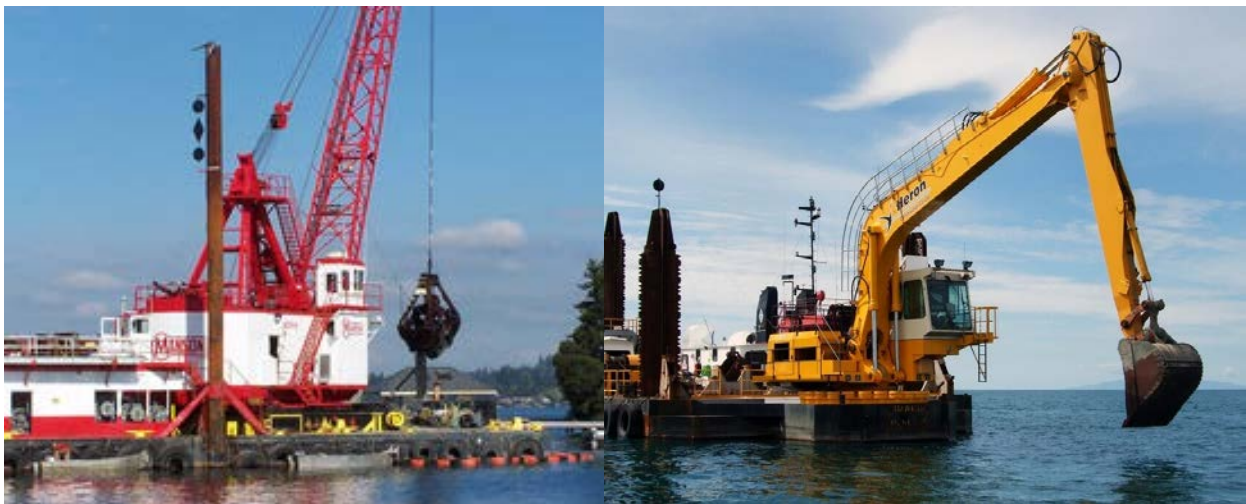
(Left) Example of typical clam-shell excavator, taken from Manson Construction website, <http://www.mansonconstruction.com/andrew/> and (right) example of long arm backhoe on barge.
